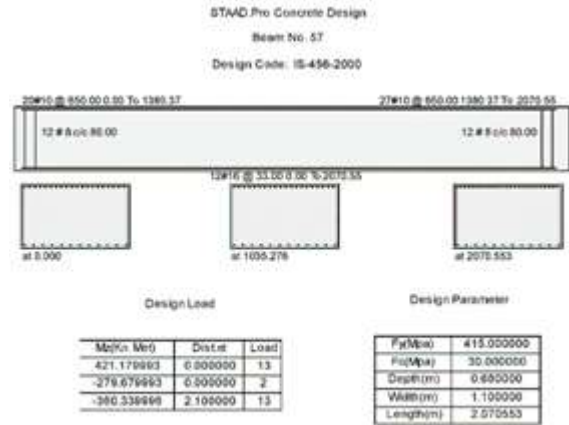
Reinforcement details of beam No.57 (Tank with full water condition in Seismic Zone IV)
